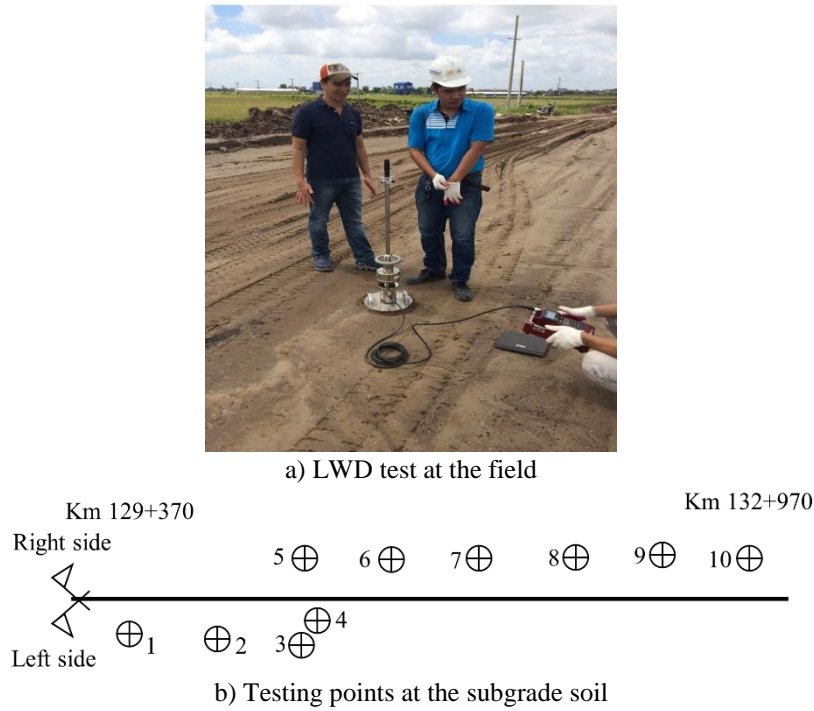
Field LWD test on the subgrade soil belonging to the Bac Giang Highway asphalt pavement in Vietnam.
